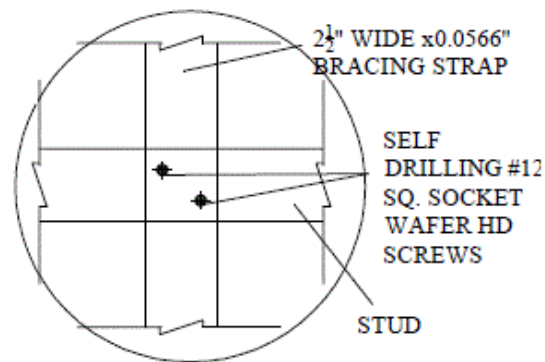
Bracing straps connection detail (Karimi, 2015a)
